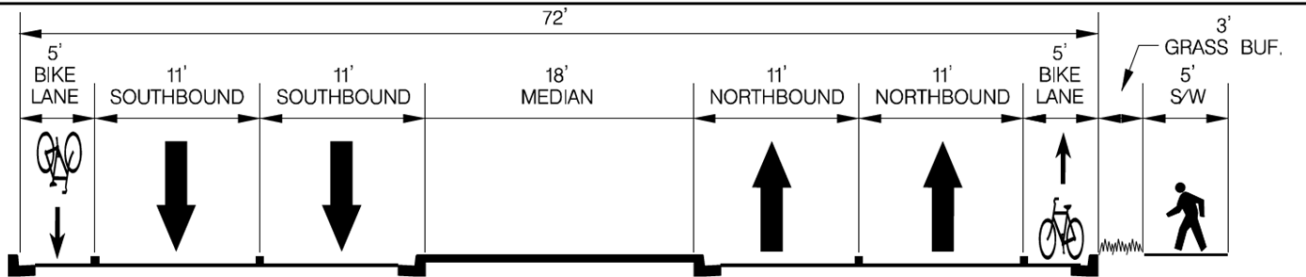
Proposed Cross-section for Ridge Road from Christiana Ct to Watts Ave.
